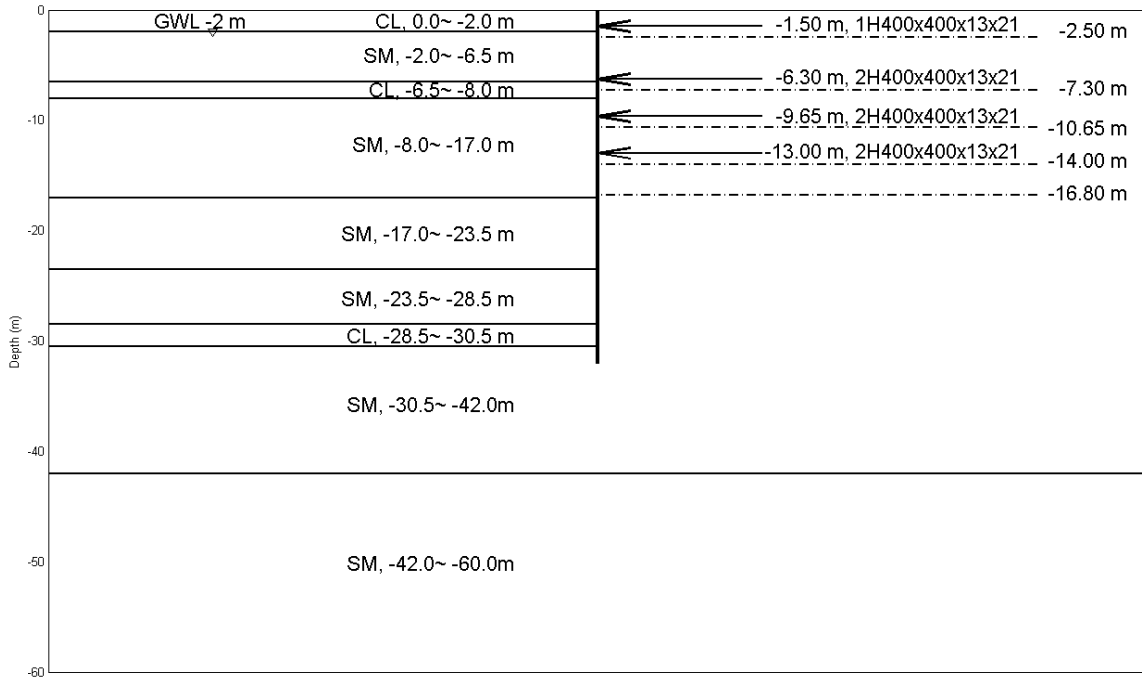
1 Cross section of retaining system and soil layers of Case A.
